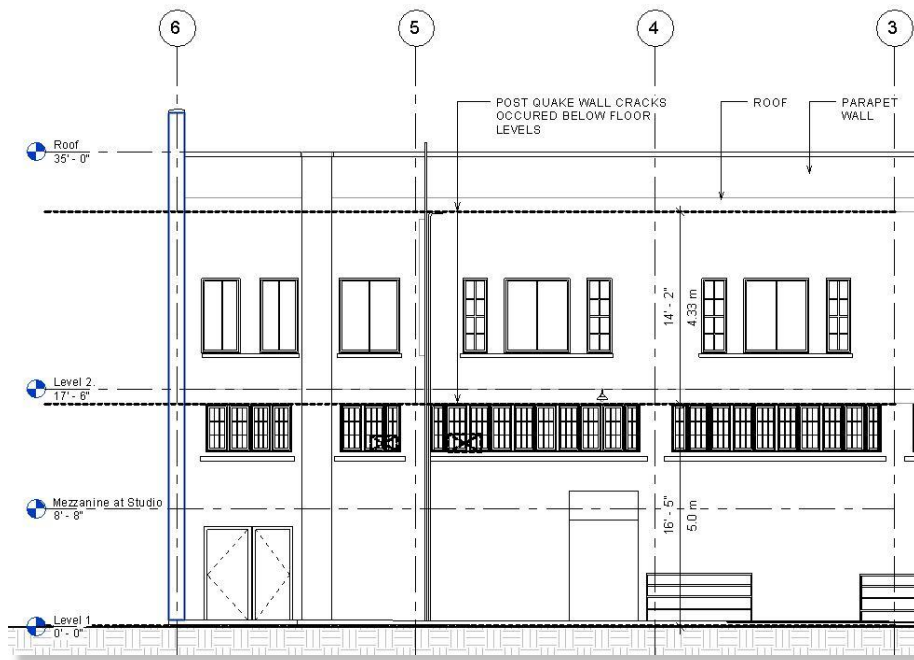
North wall 2D drawing with dimensions showing below floor cracking
